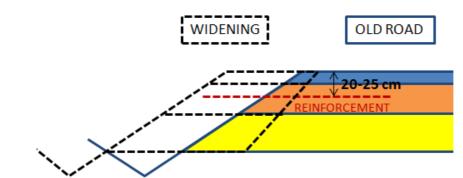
Reinforcement should be installed deep enough (20 - 25 cm) inside the structure.
